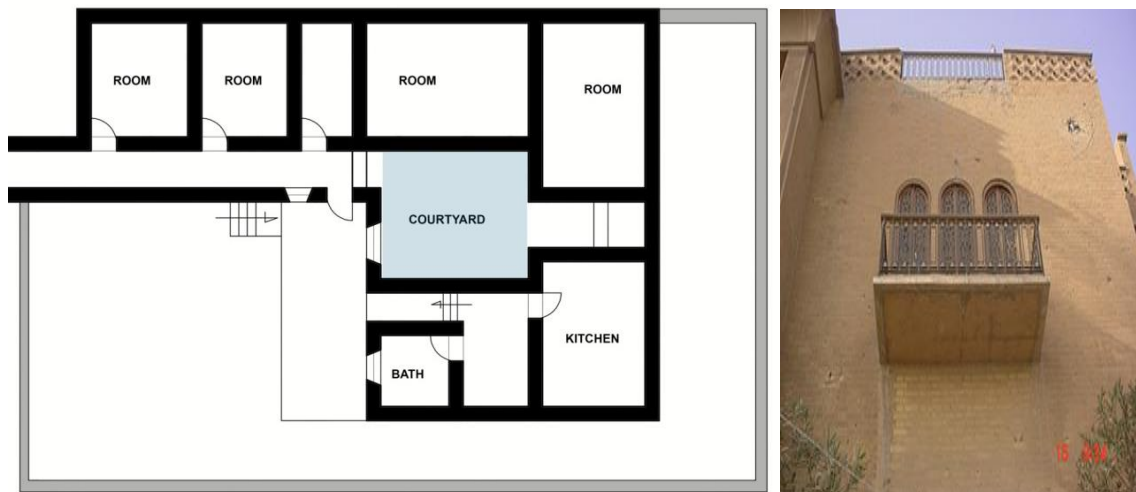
The ground floor plan of the harem section and an image of the external balcony in *Bayt* Marjan
